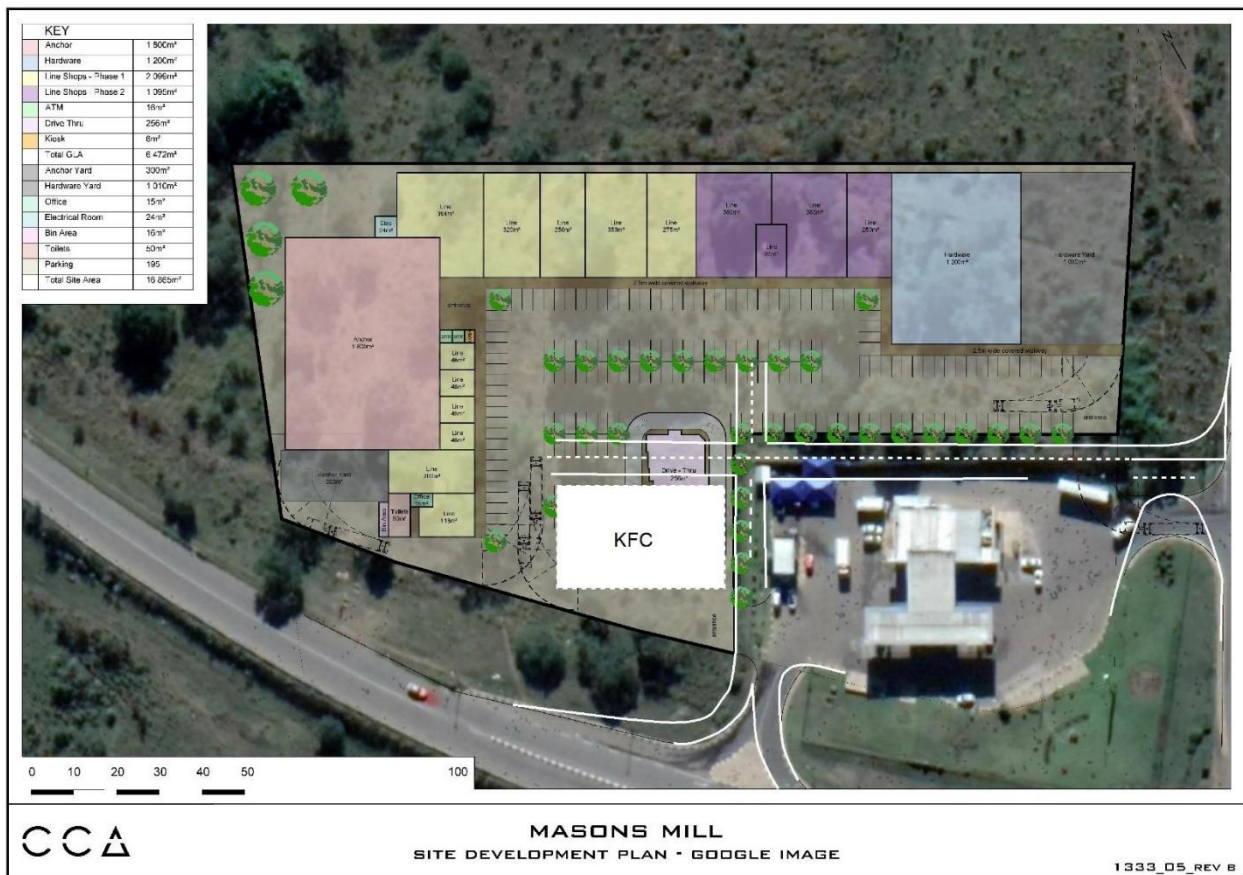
Site development plan (CCA Architects, drawing 1333\_D5\_Rev B).
